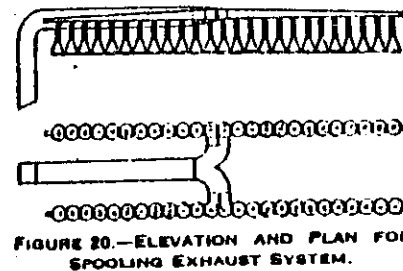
ELEVATION AND PLAN FOR SPOOLING EXHAUST SYSTEM.
